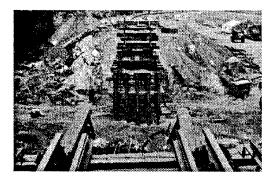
Repairs to a Railway Bridge Connecting Croatia and Bosnia.
